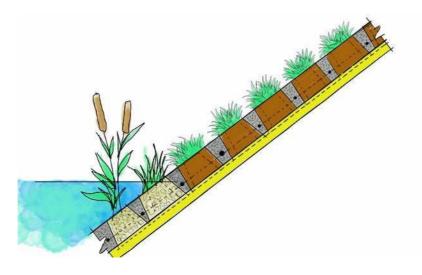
GRASSED CELLULAR CONCRETE PAVING AT EMBANKMENT
